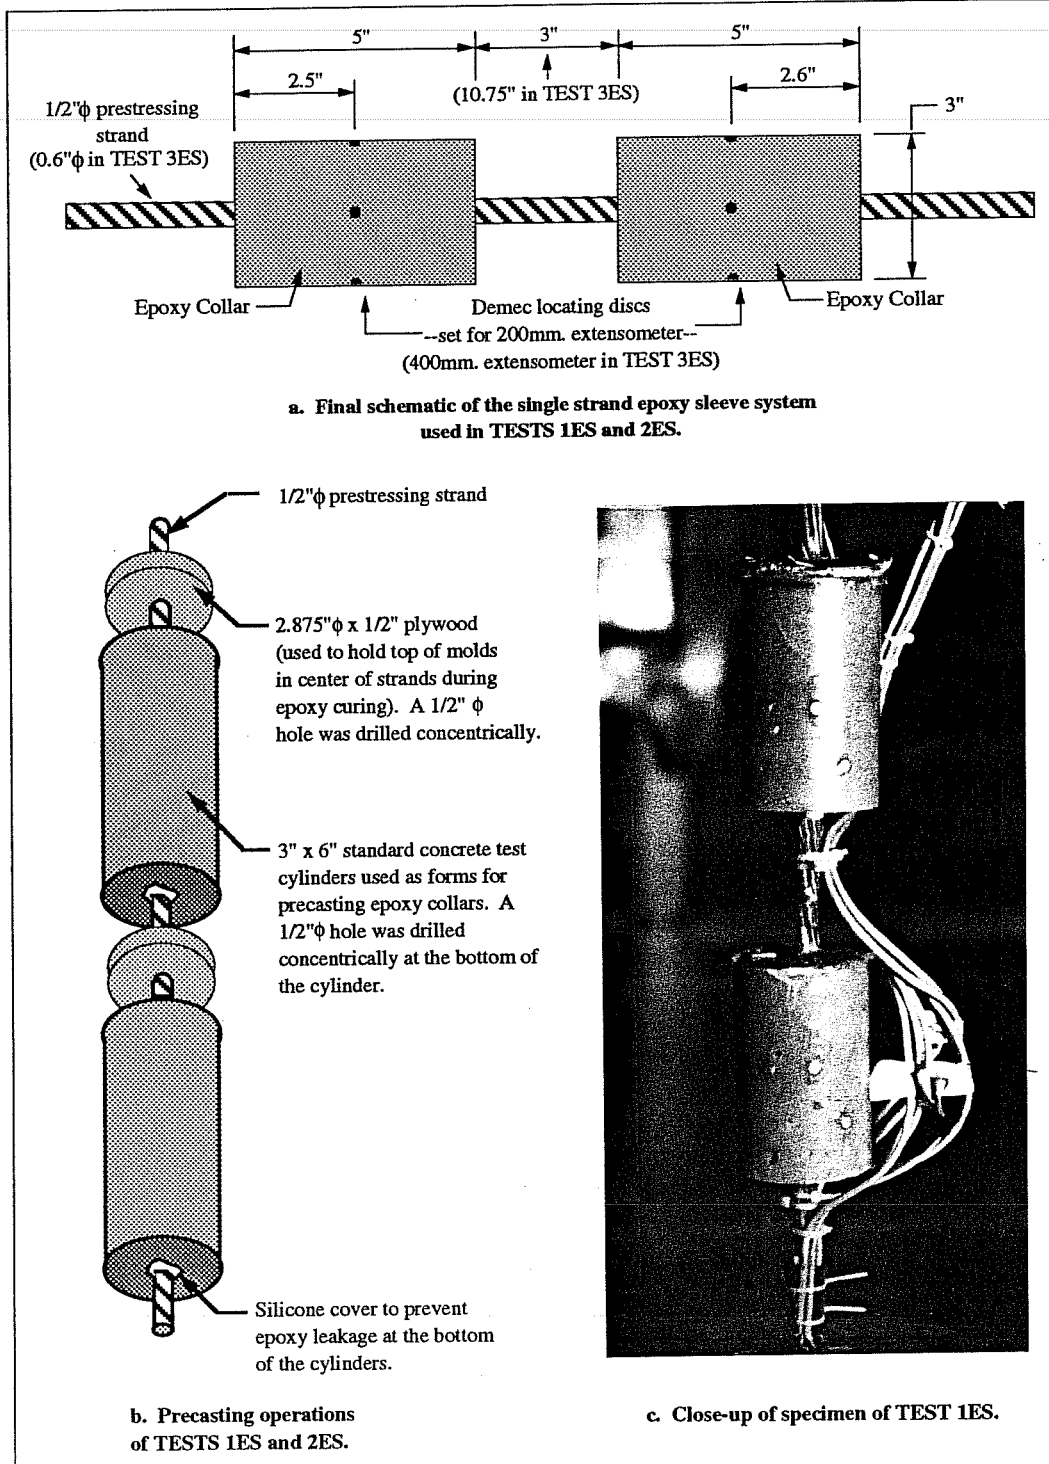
Schematic of the epoxy sleeve systems used in single strand tests.
